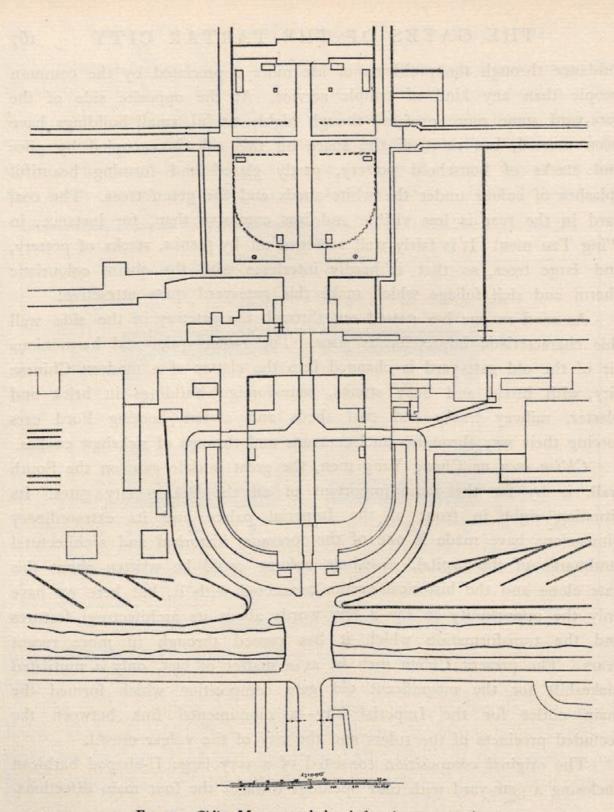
Ch'ien Men, general plan, before the reconstruction.
